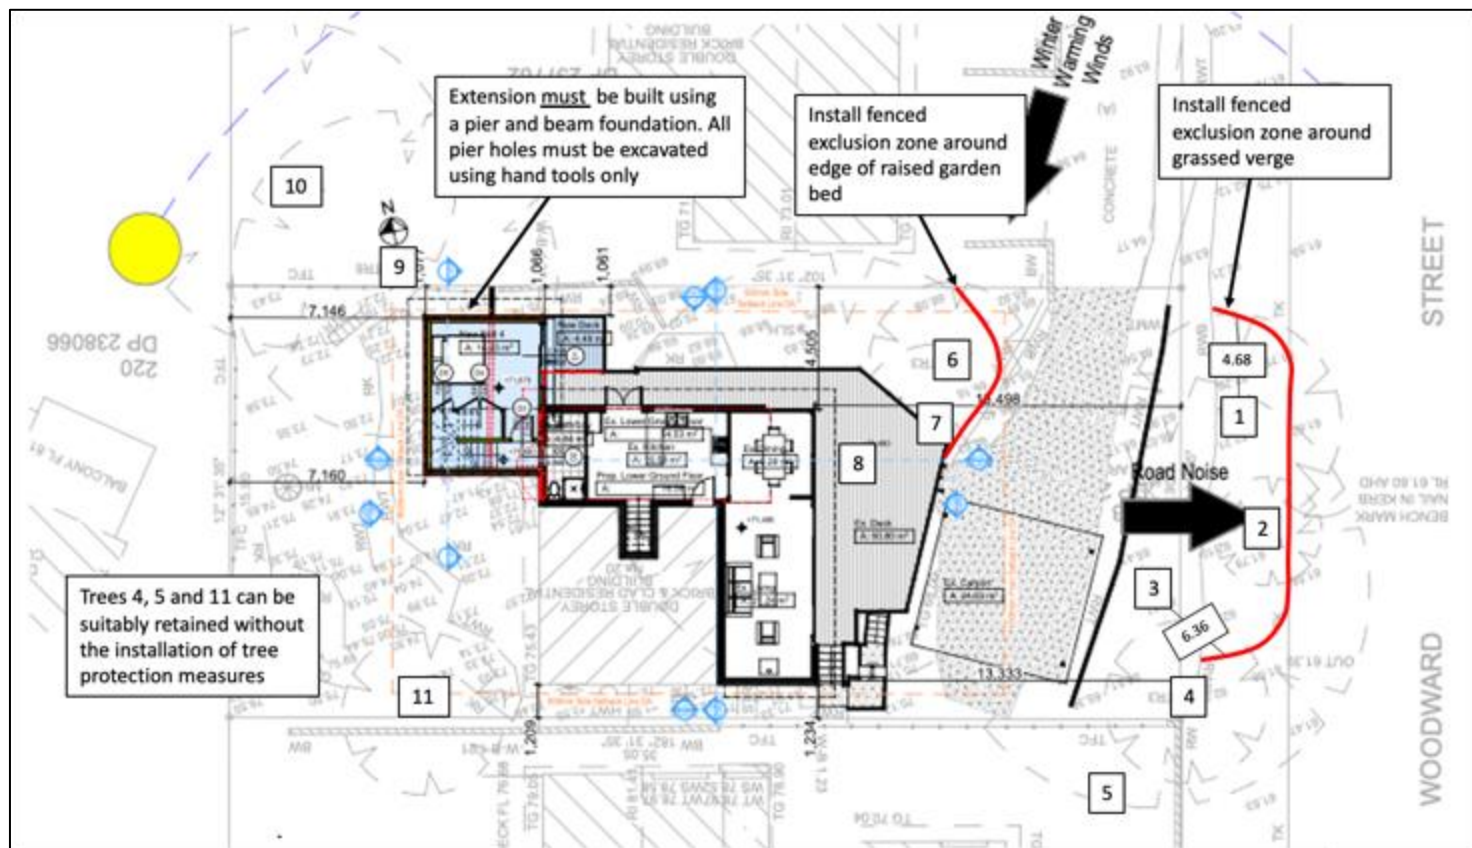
Required tree protection plan for the proposed development at 20 Woodward Street, Cromer. Site Plan (DA1004) drawn by *Rapid Plans* (10/06/2021) annotated by William Dunlop of *Temporal Tree Management Pty Ltd* (27/09/2021).
